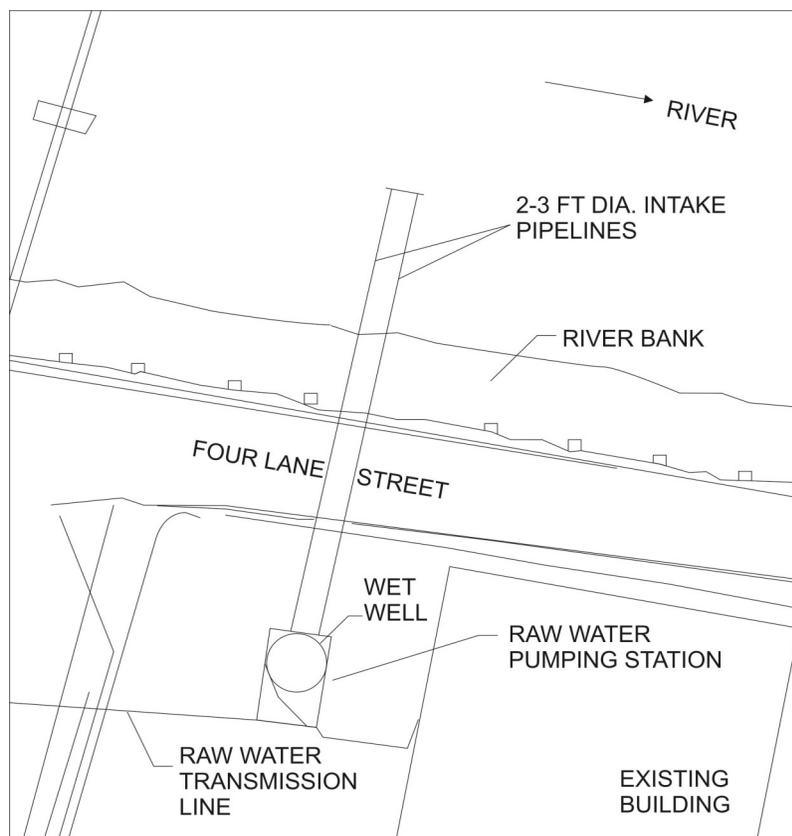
PLAN SHOWING THE LAYOUT OF THE WATER INTAKE FACILITY
